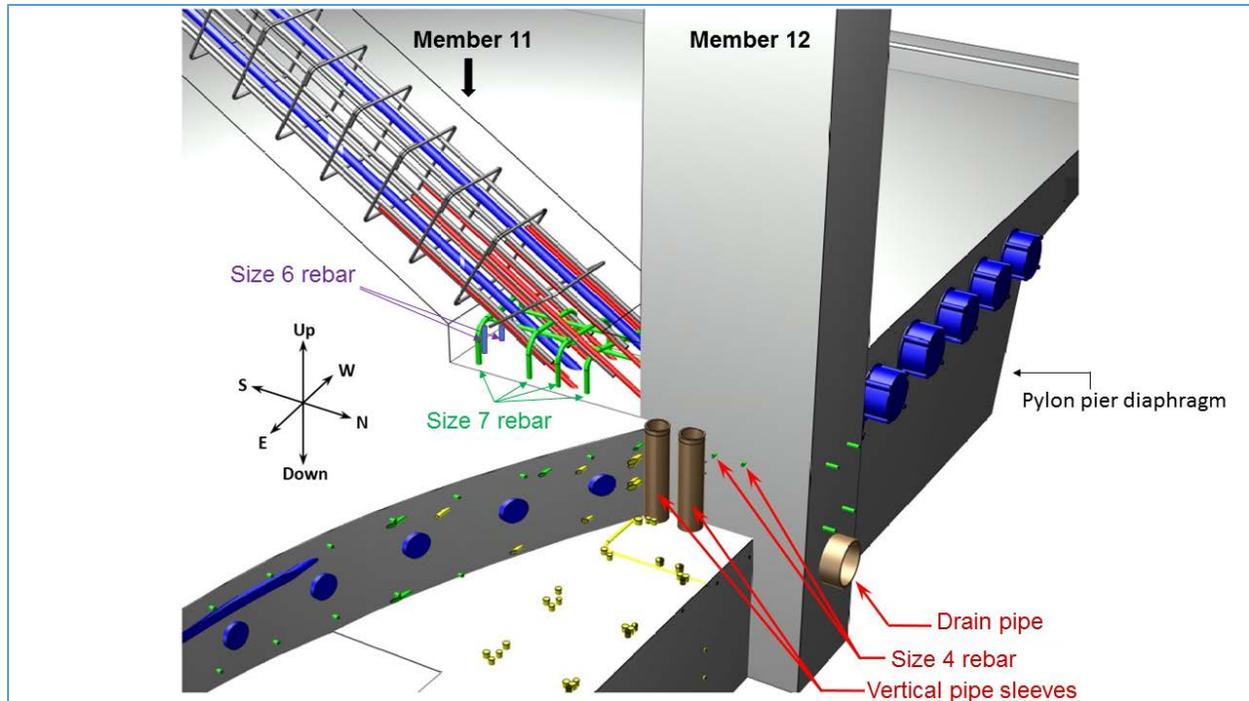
Main span, north end, showing steel rebars in member 11, vertical pipe sleeves, end of drain pipe location, and size 4 rebar at member 12. (Source: FHWA 2019)
